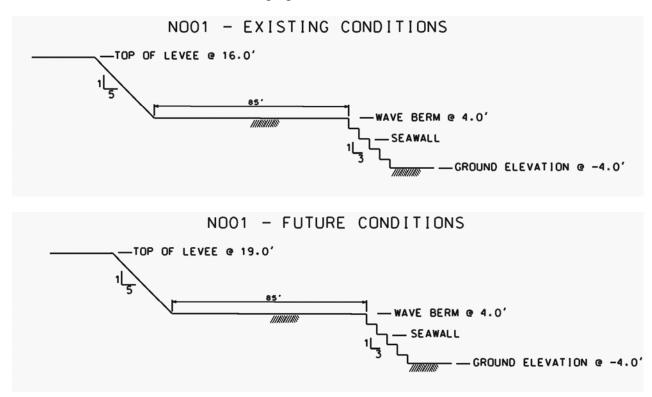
Typical Levee Design Cross-sections New Orleans – Metro Lakefront Levee (NO01)
